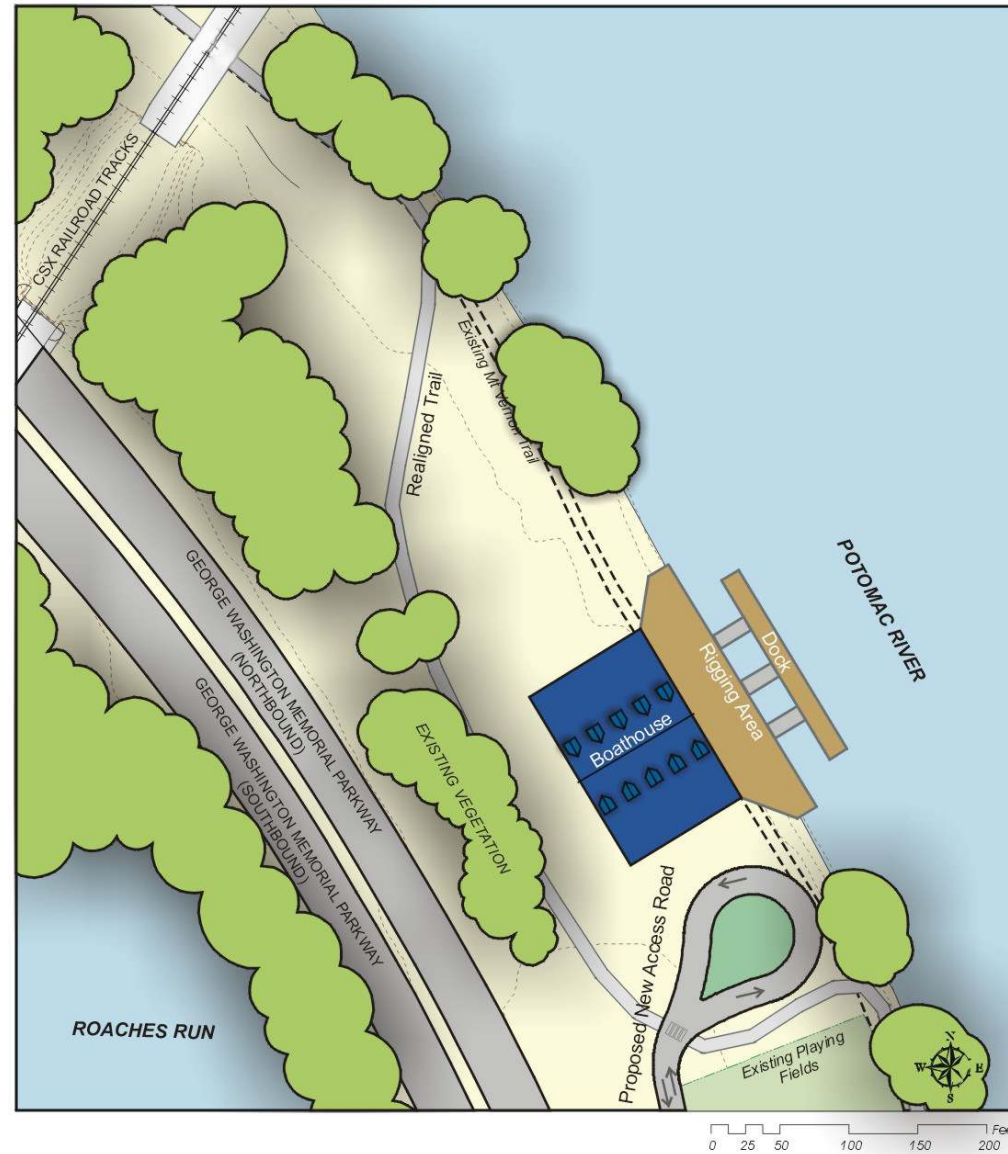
Conceptual Site Plan, Maximum Program Boathouse
